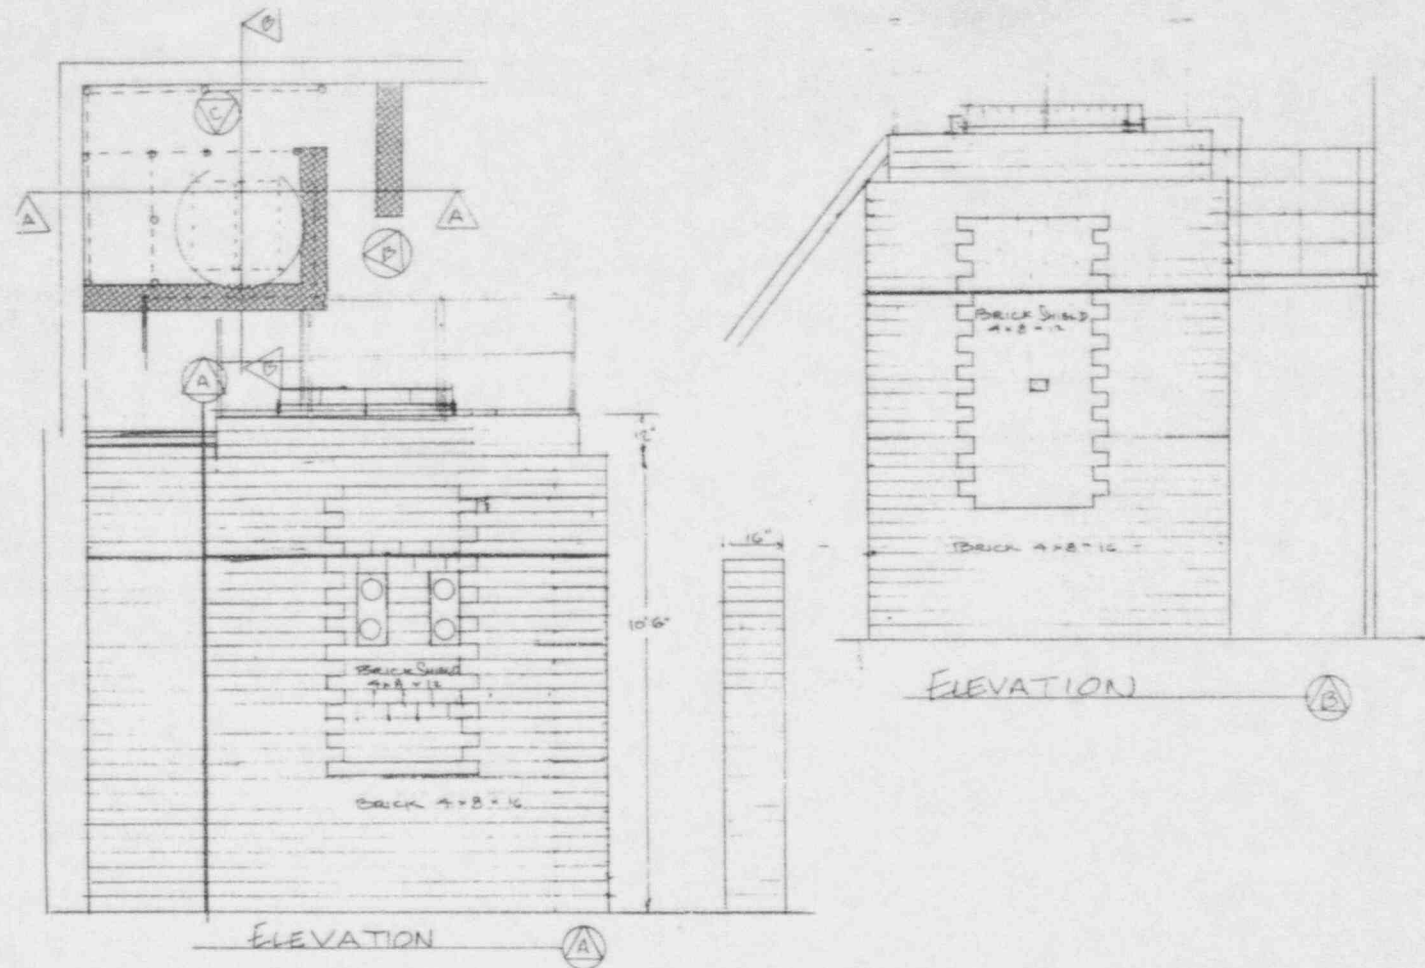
External concrete block shielding for AGN-201 reactor. Plan view of shielding. Elevation A is view facing north. Elevation B is view facing west.
